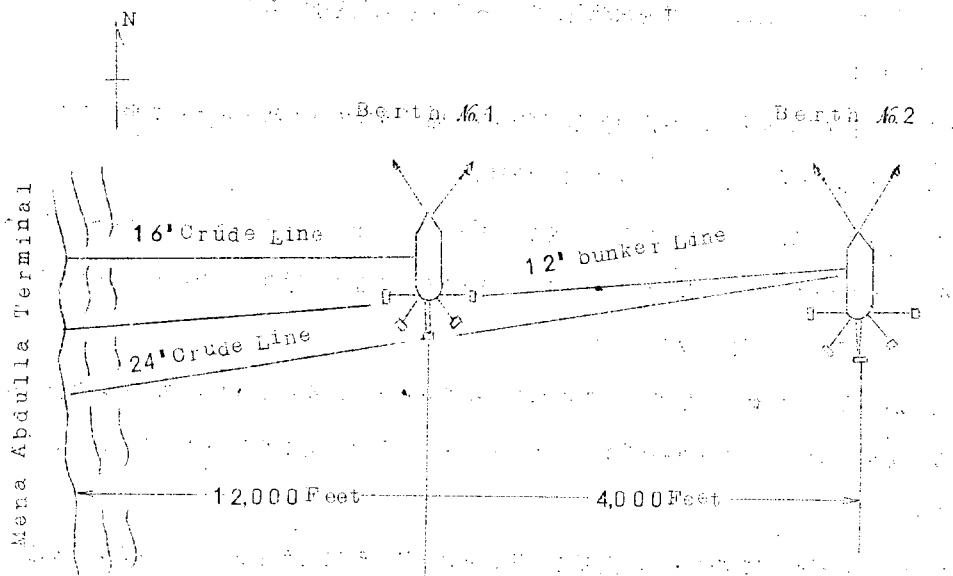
DETAIL OF BERTHING FACILITY
